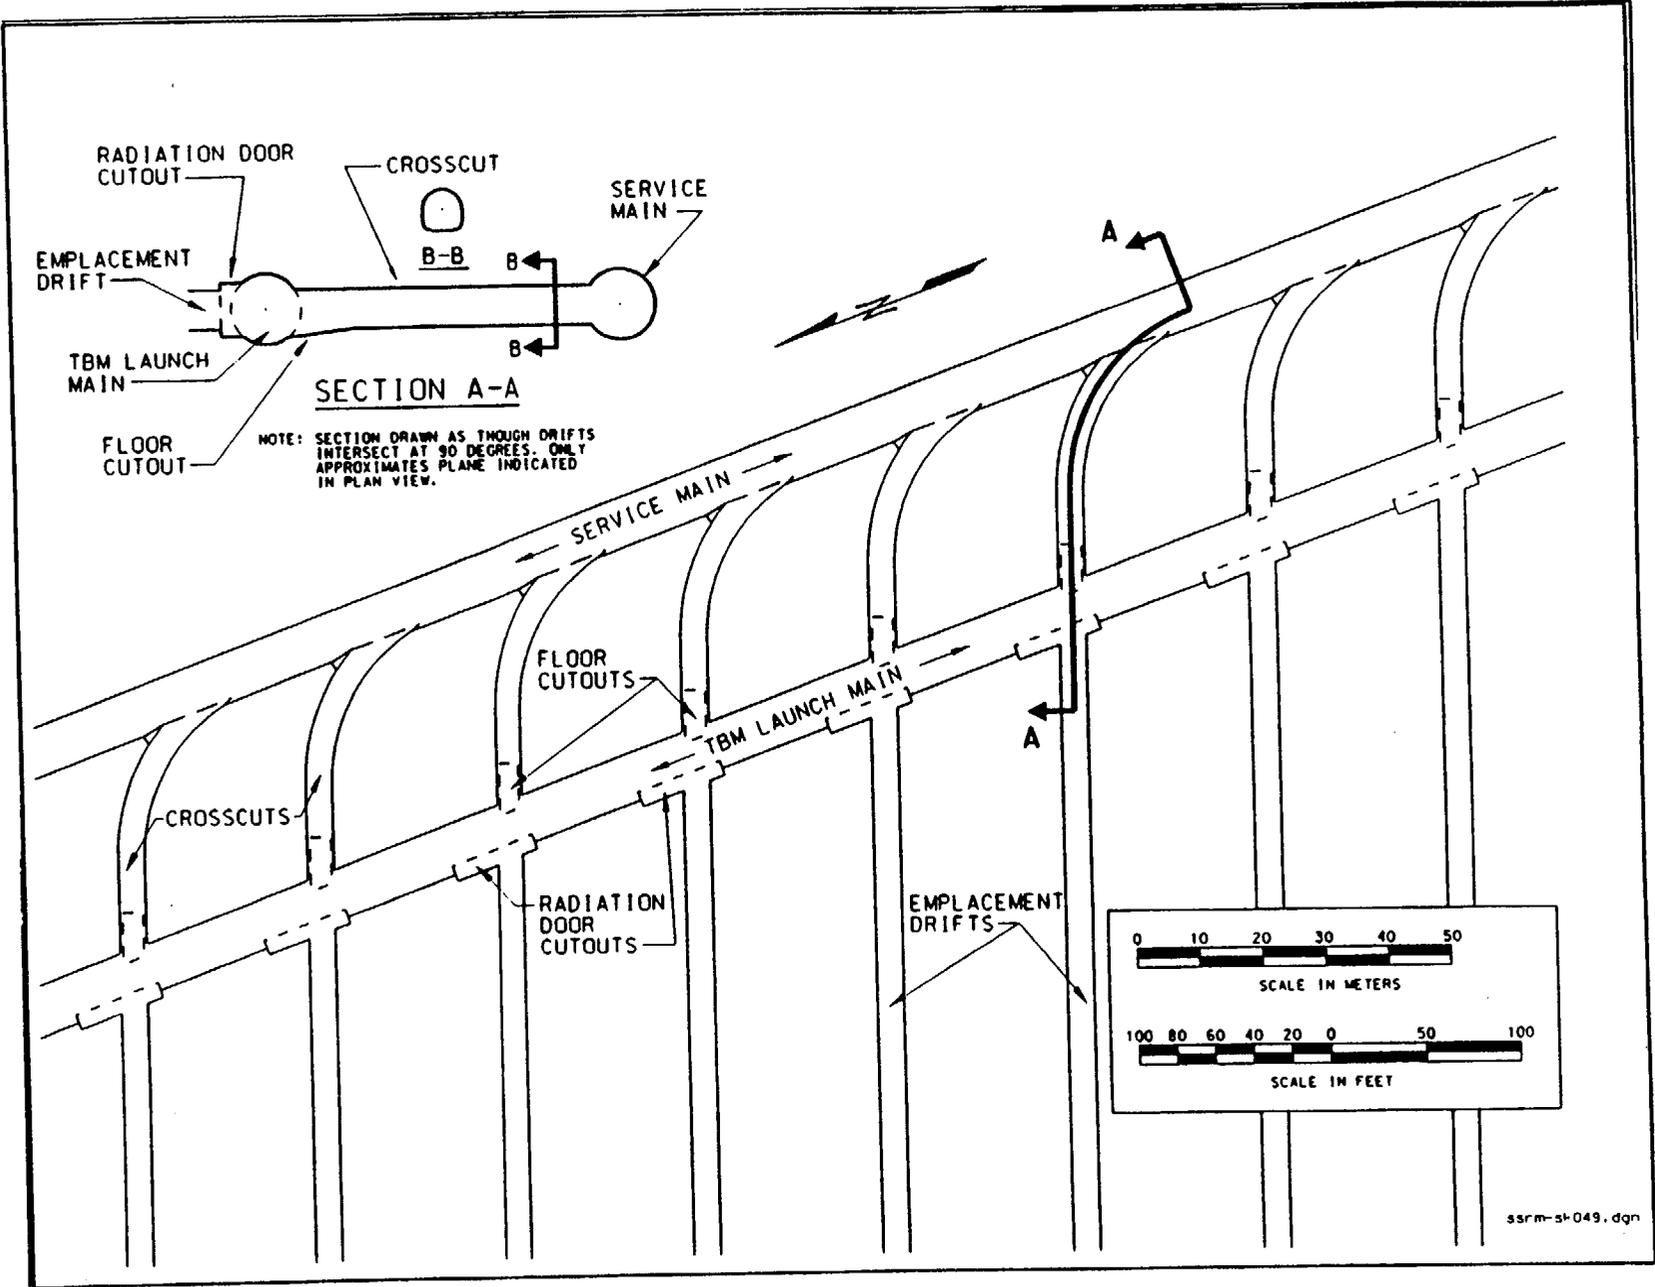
Detailed Layout of Drifting in Service/Launch Mains Area
